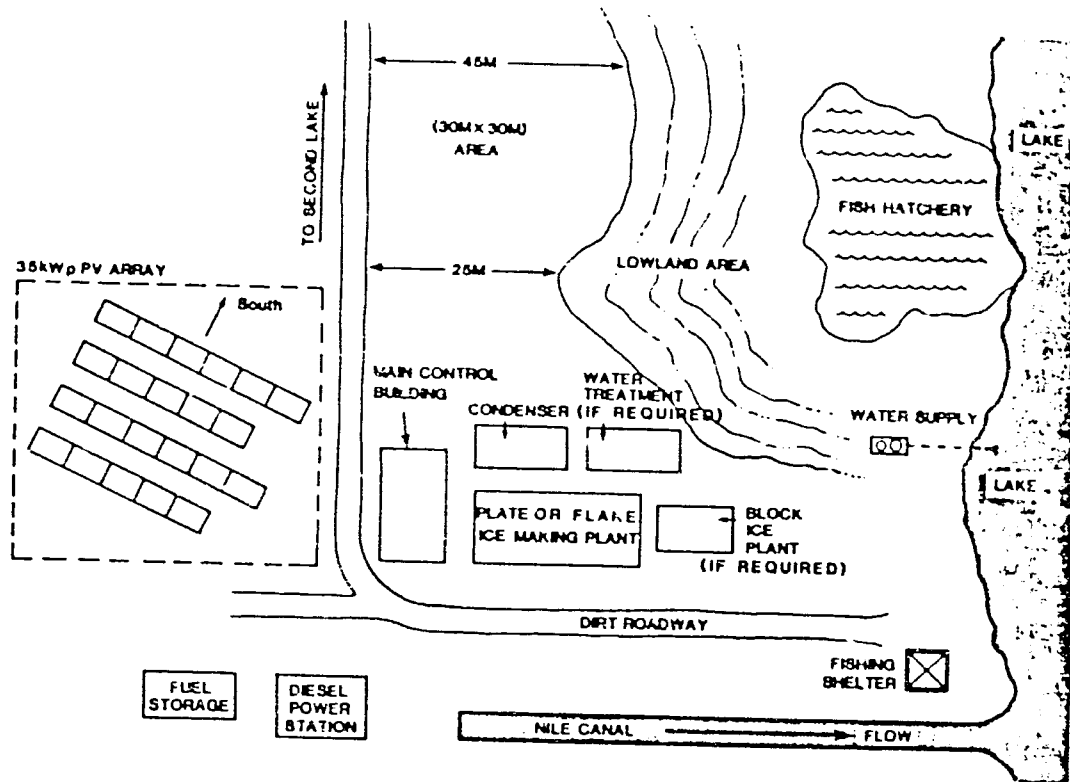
SITE EQUIPMENT LAYOUT
